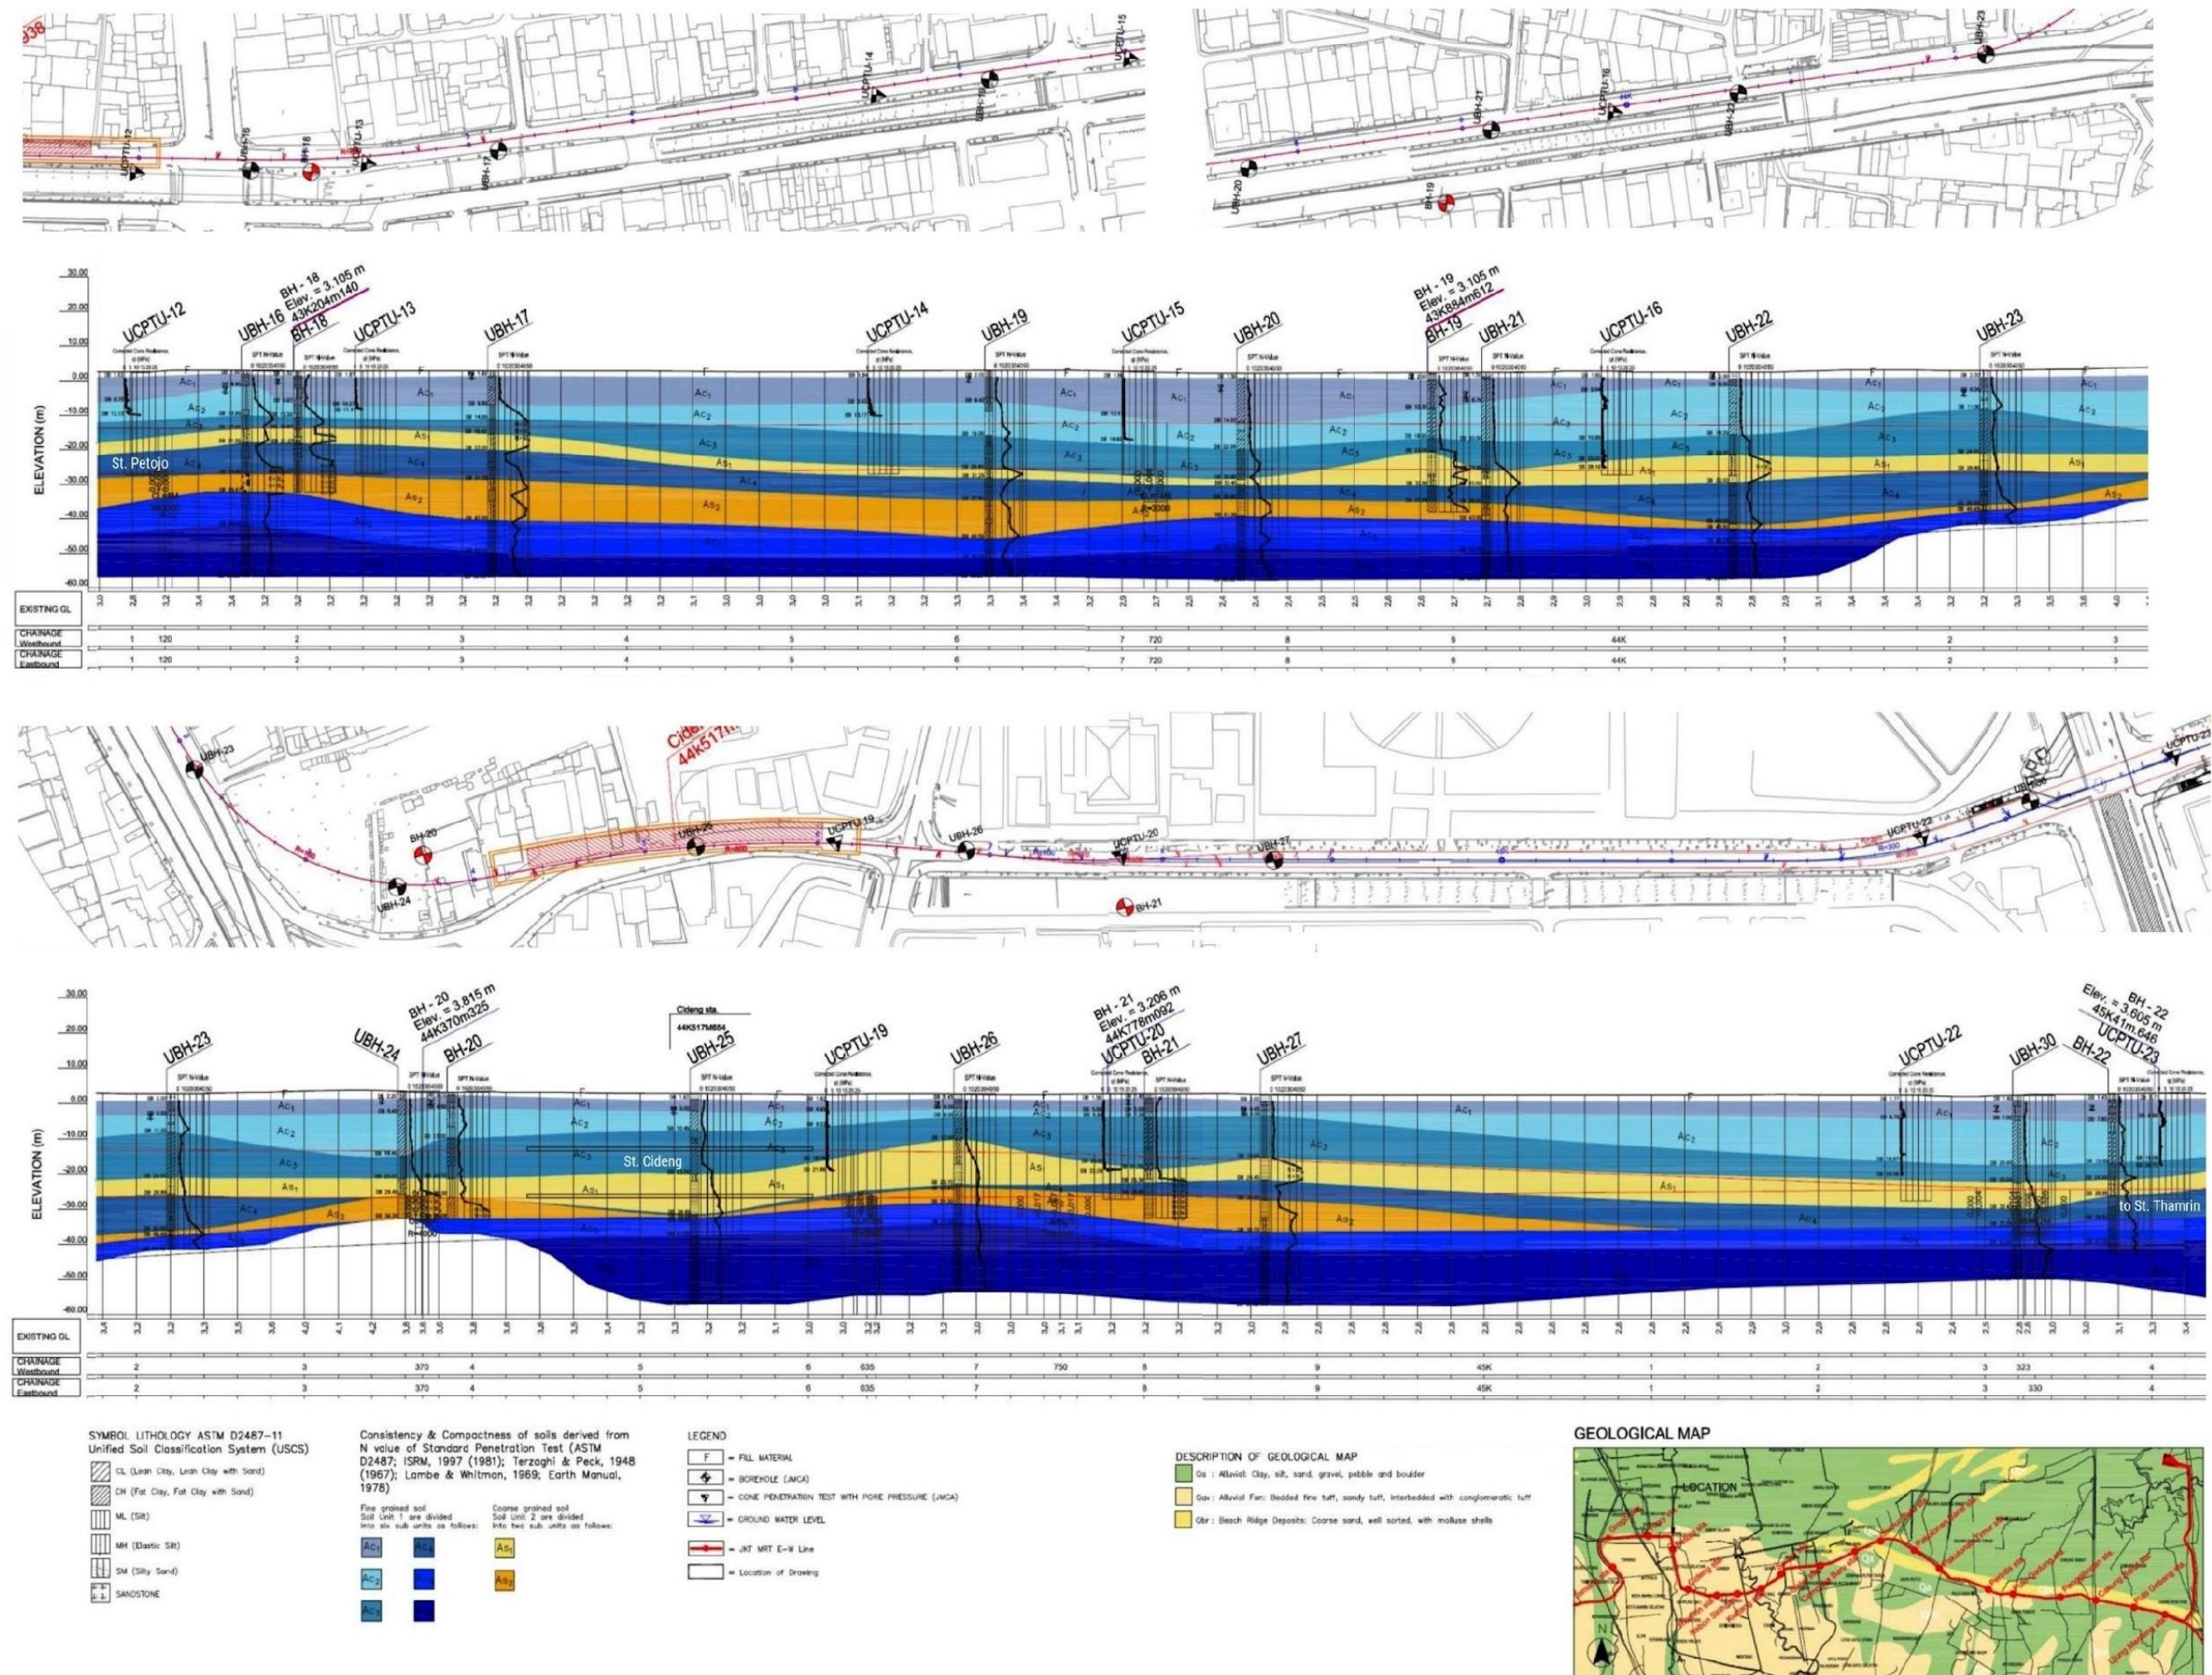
Tunnel Excavation Path Plan for Geotechnical Soil Profile of St. Petojo to St. Thamrin
